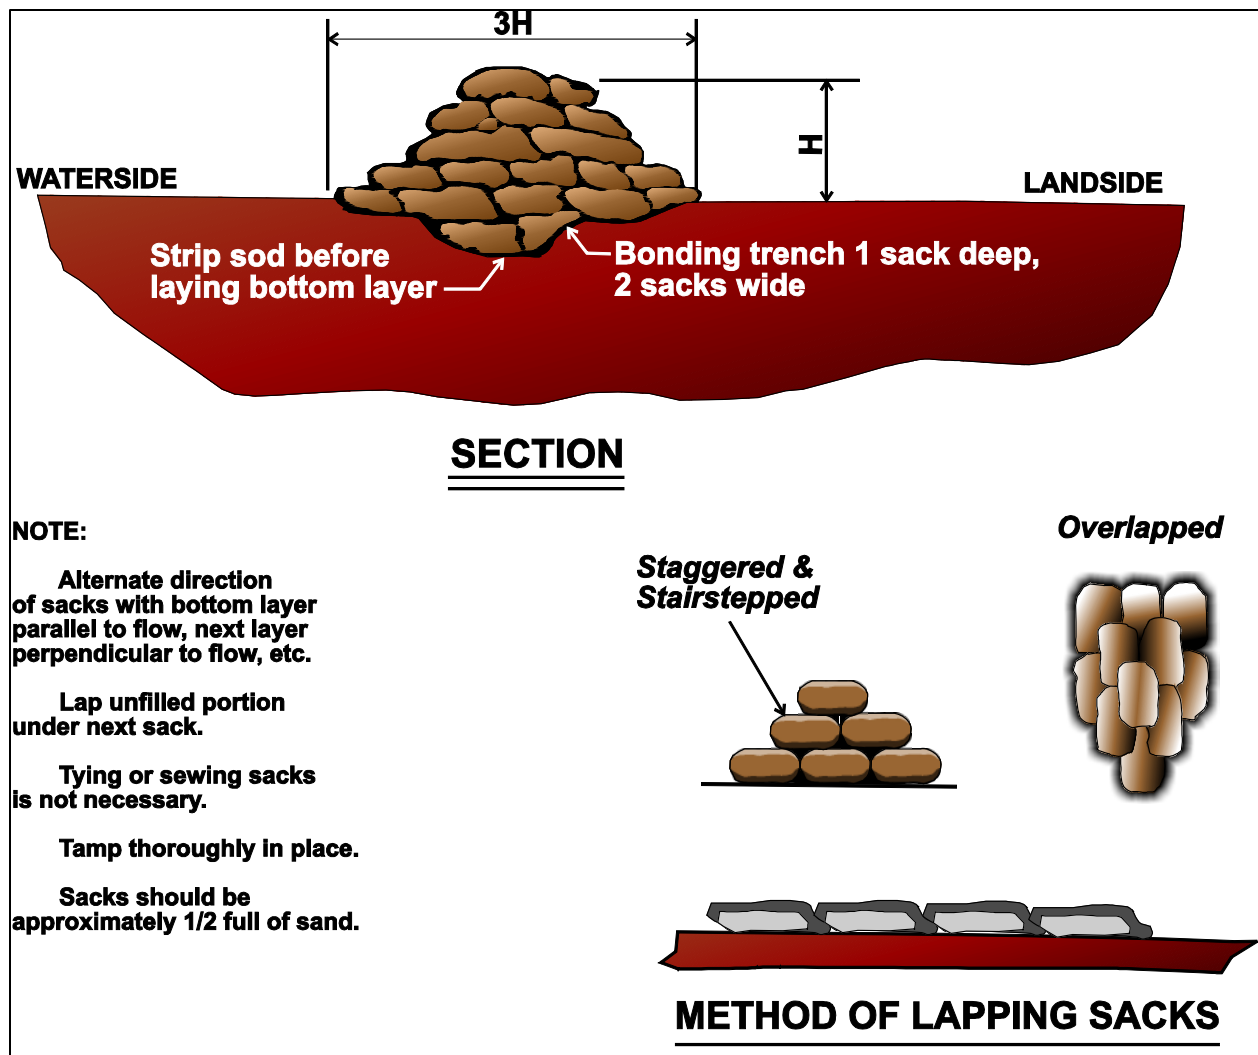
Proper Sand Bag Barrier Construction Techniques.
